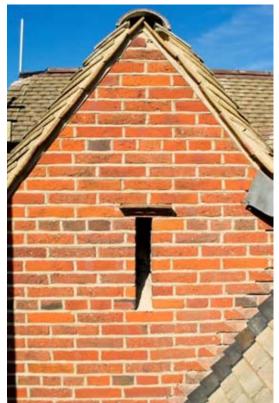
Set-back gable on east elevation, east wing (#BCA16-0133)
